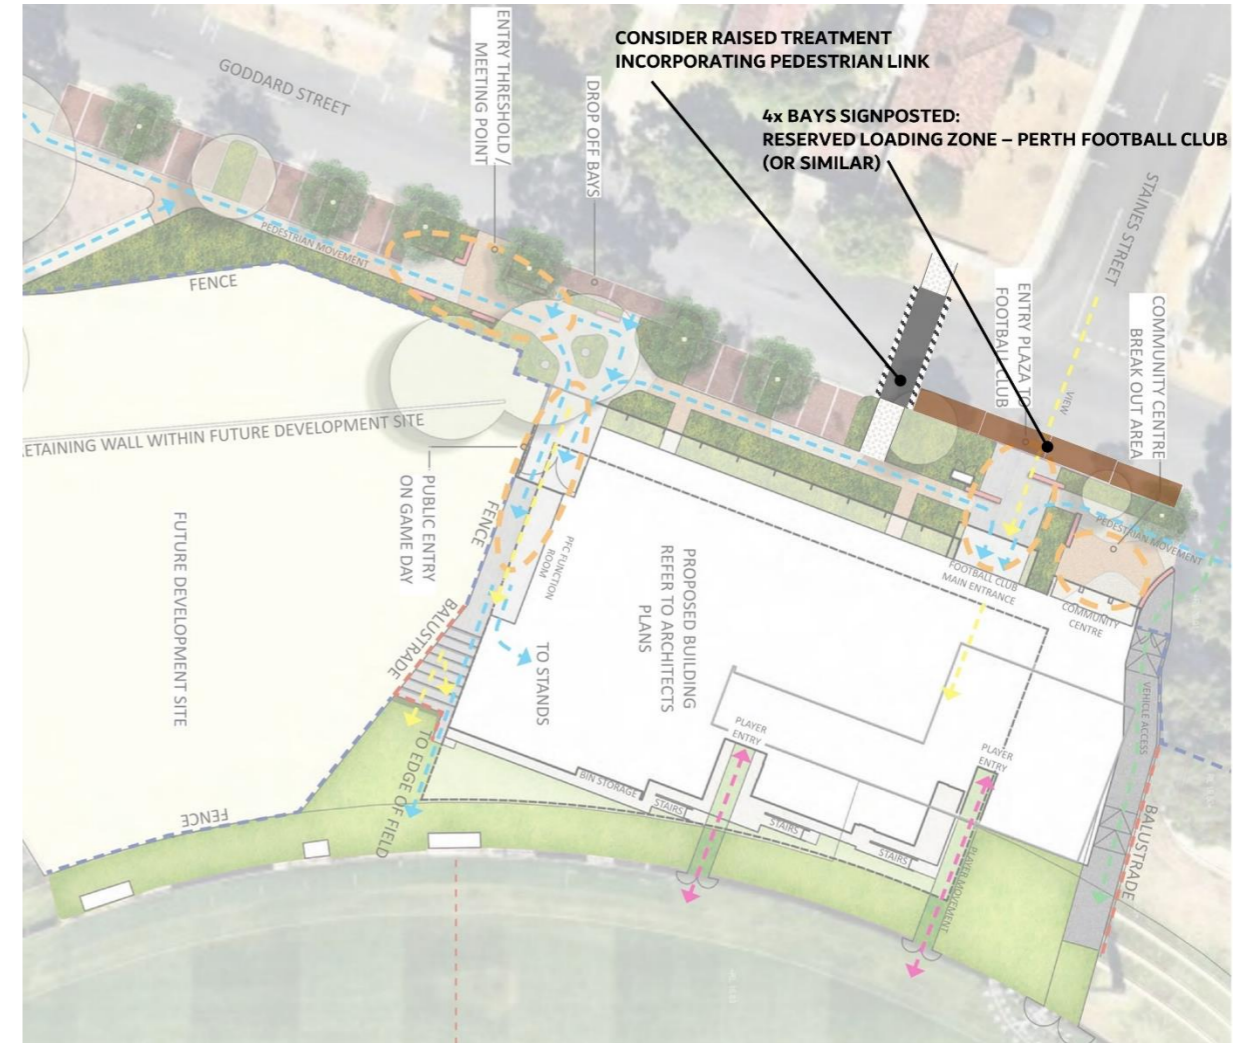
Servicing and loading arrangements (base plan source: Emerge Associates, Rev E dated 06/06/23)
